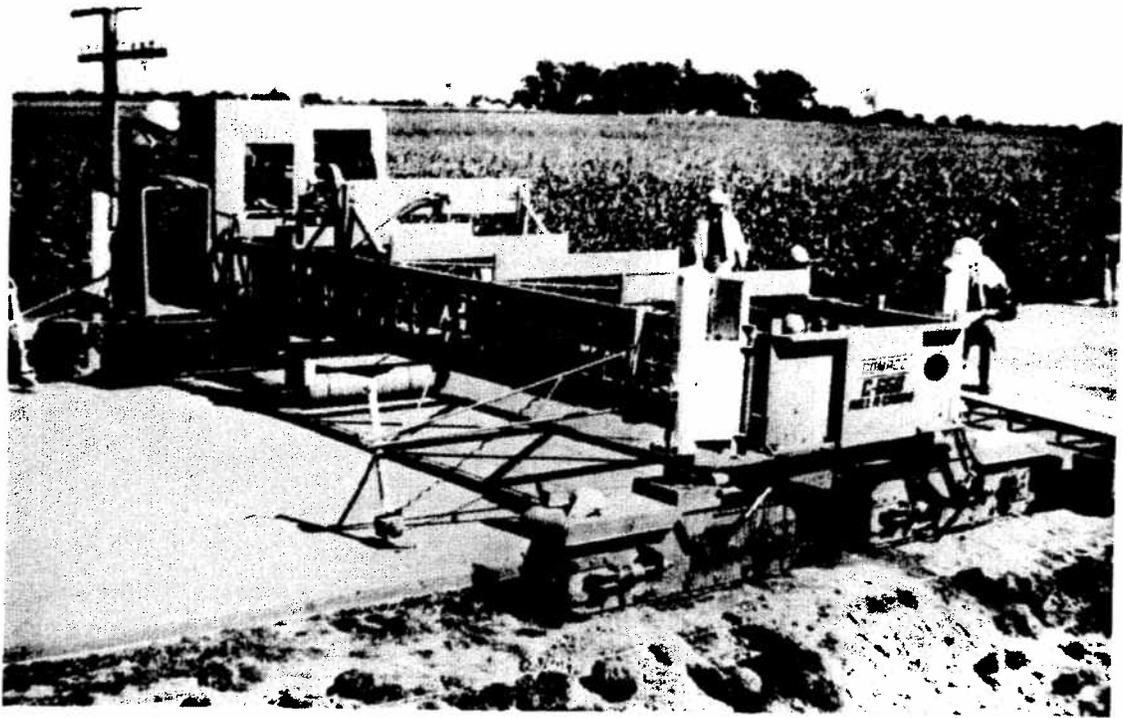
PLASTIC GROOVING TECHNIQUE USING A RIBBED ROLLER TUBE
